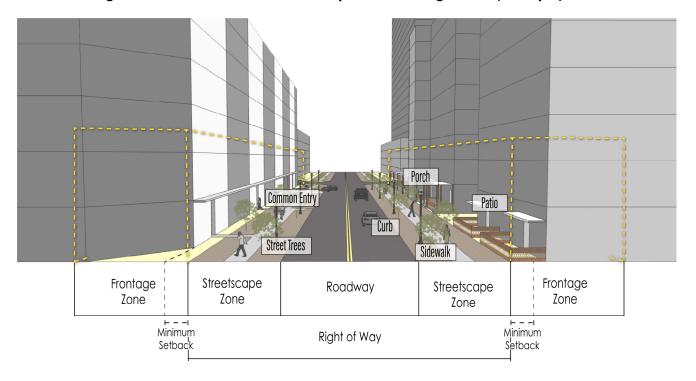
Residential Streetscape and Frontage Zone (example)
